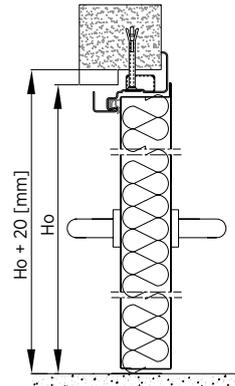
Installation of the double-leaf door with the corner frame in a masonry wall, vertical cross-section
